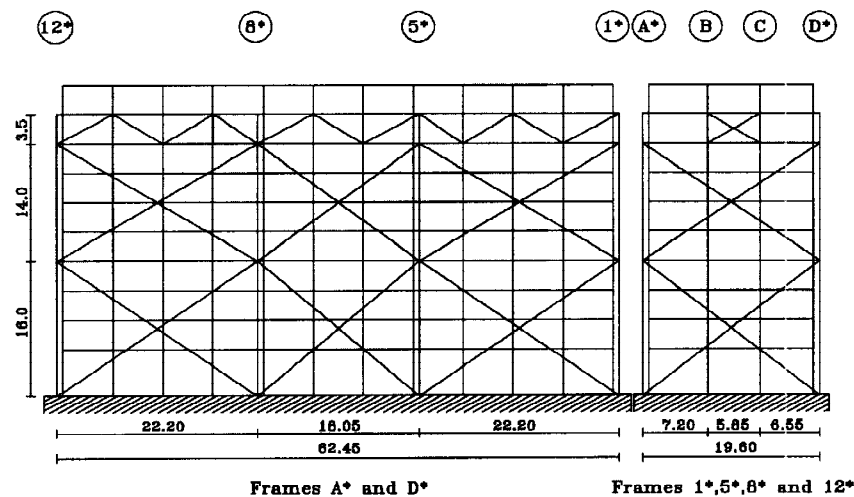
Elevations for the existing MBF retrofit (dimensions in meters)
